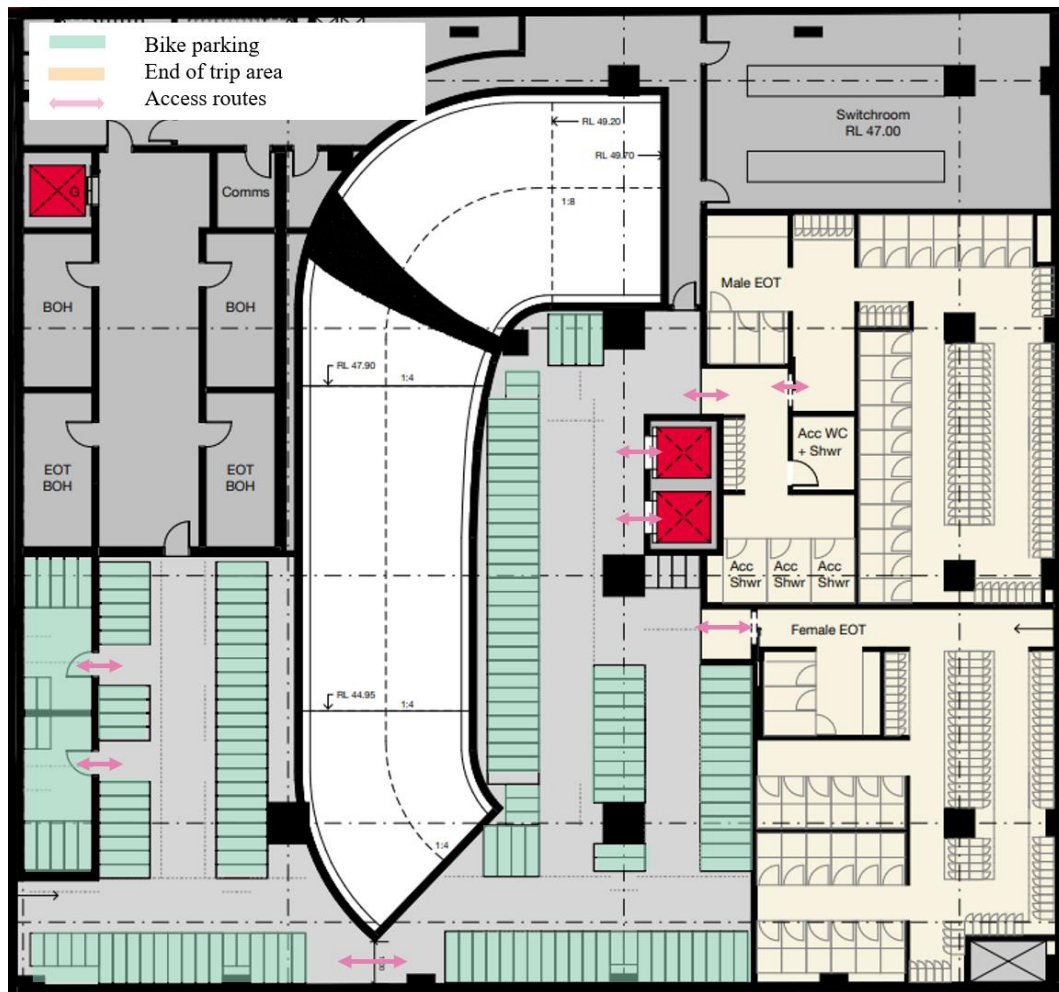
Basement Level 2 layout containing EOT facilities and bike parking
